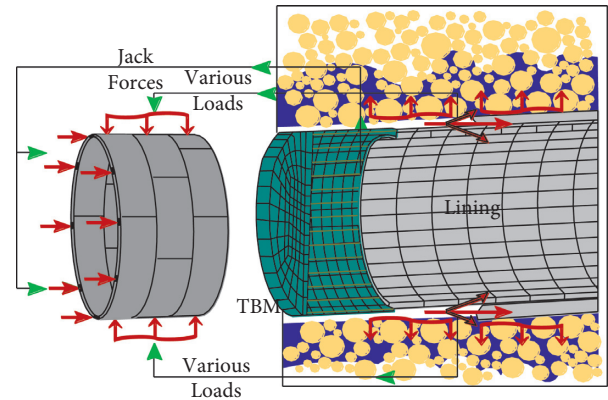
Various loads acting on the linings during construction (including grouting and earth and water pressures).
